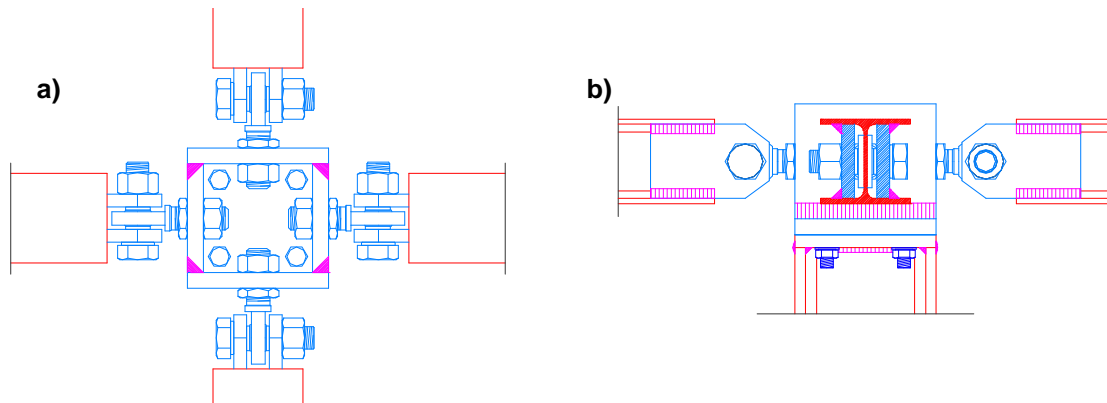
Central connection of the crowing beams. a) plan view, b) lateral view
